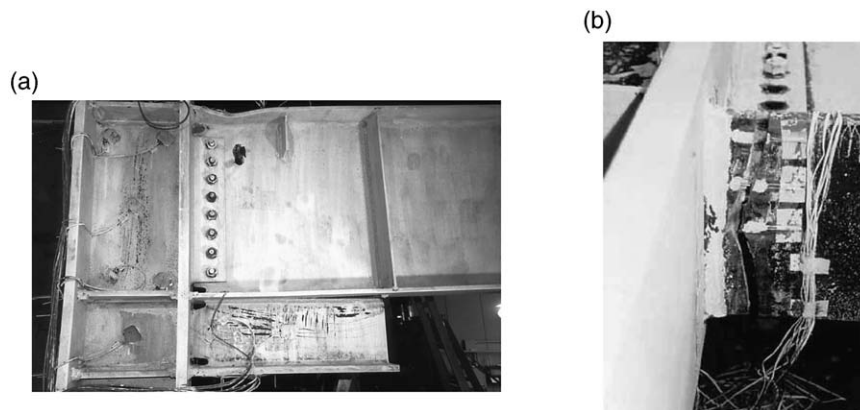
Failure modes of SAC test specimens (SAC [9]), (a) Haunch tip cracking of UCSD specimen, (b) Beam top flange fracture of UCB specimen.
